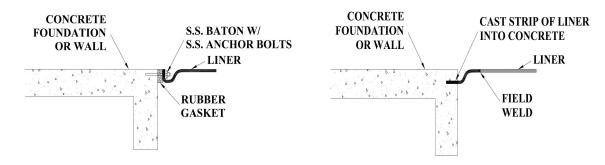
Typical HDPE Fastening to Concrete Structures Detail
